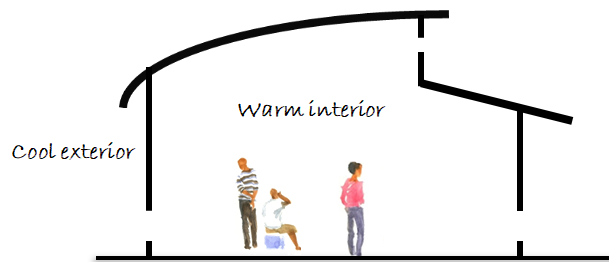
Sketch of a building in elevation showing a small upper vent.
